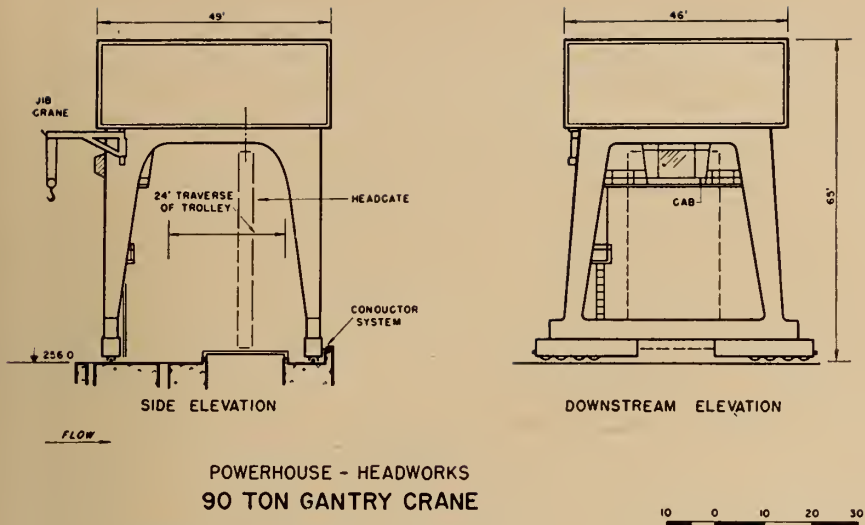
Powerhouse, 90-ton headworks gantry crane.
